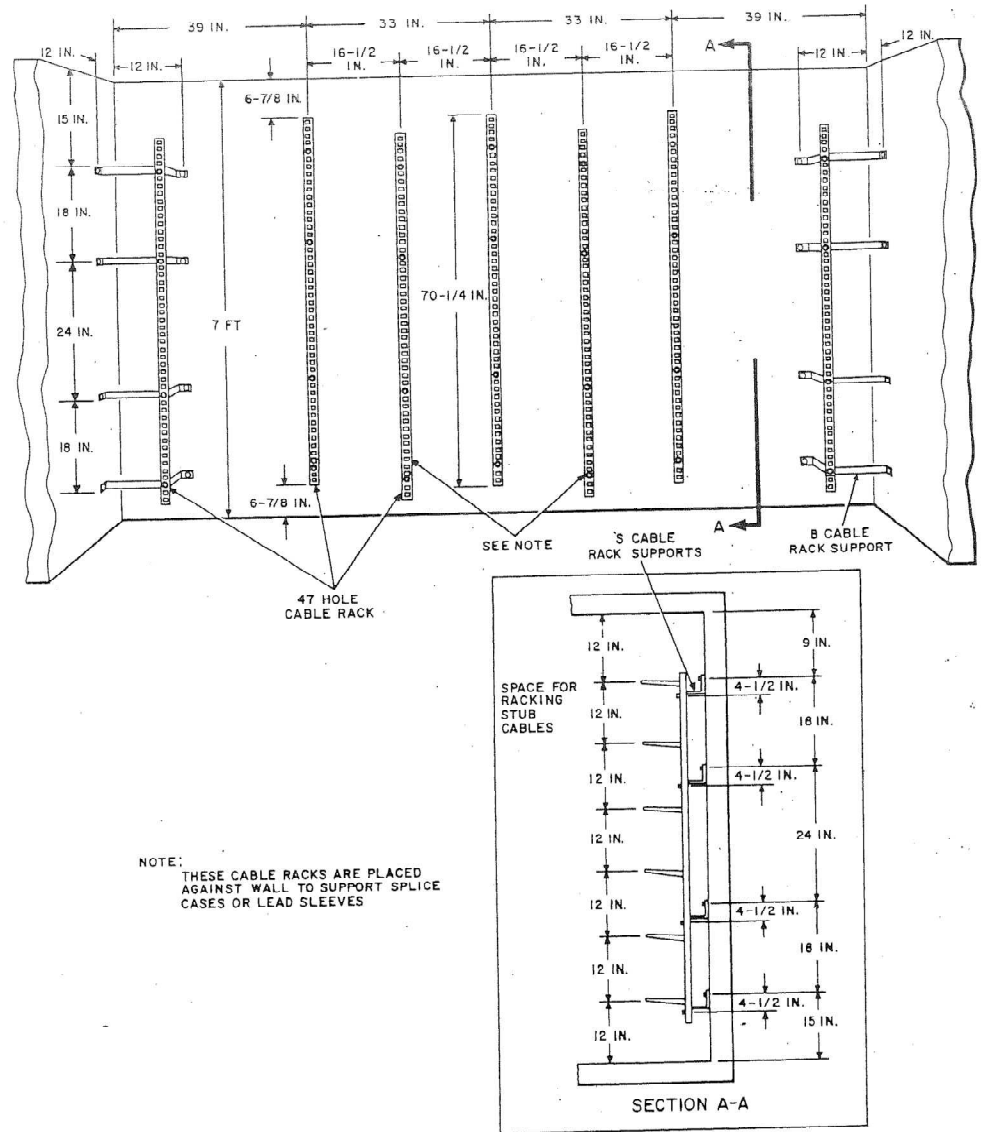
Location of Cable Racks and Hooks in Typical Double Bay, Double Rack A-Type Manhole
